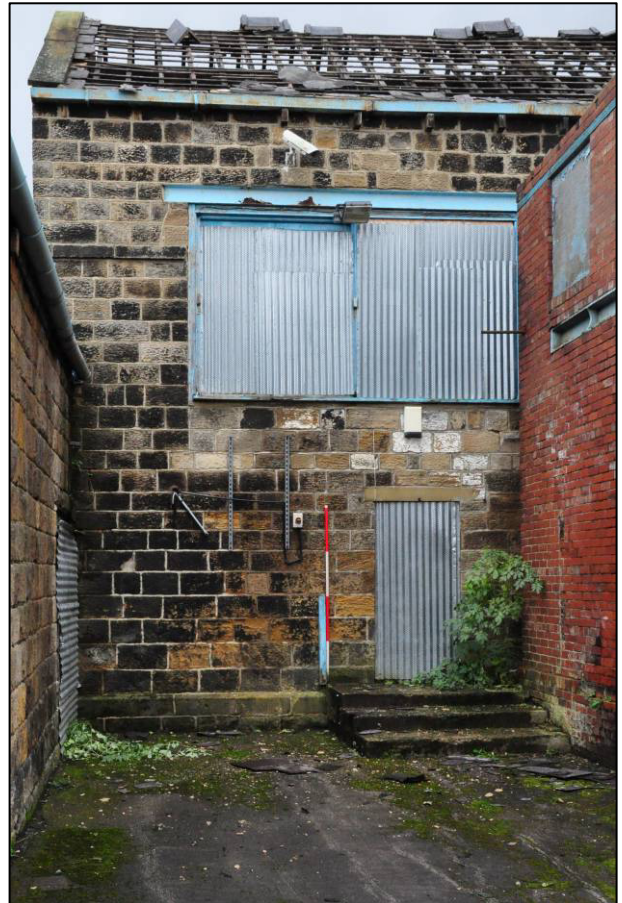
Northern engine house, north end of west elevation, looking E (photo 11791).
